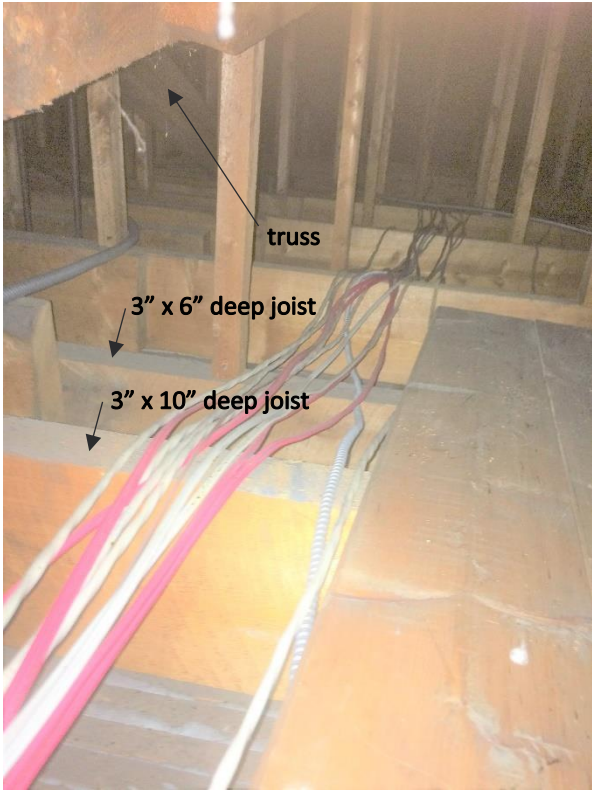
Alternating roof joists. The joists labelled span from truss to truss.
